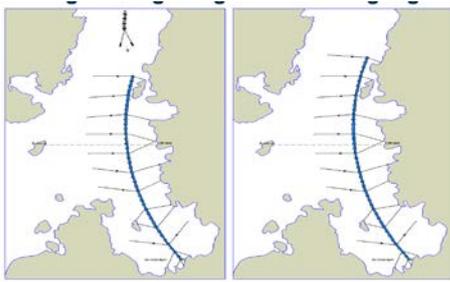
Towing and connection of ramp and high bridge segments at assembly site
